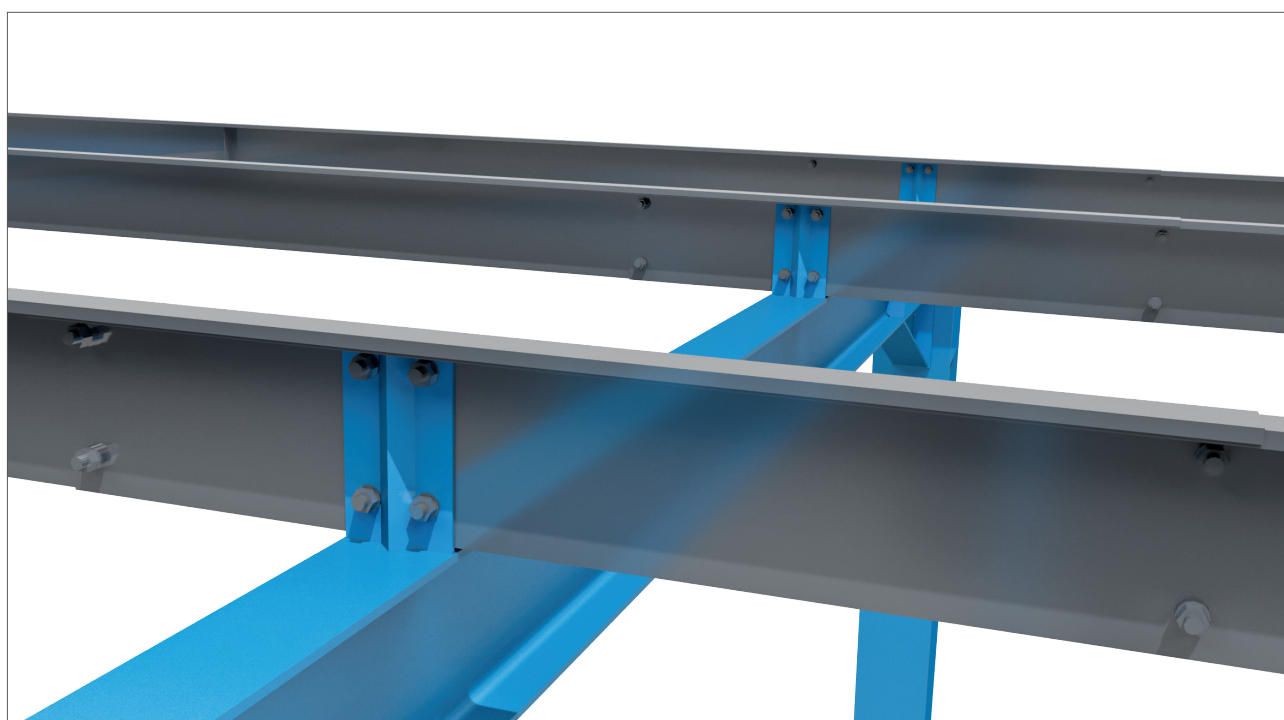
Detail of the end bay purlin connection to the primary structure in the METLAP system
